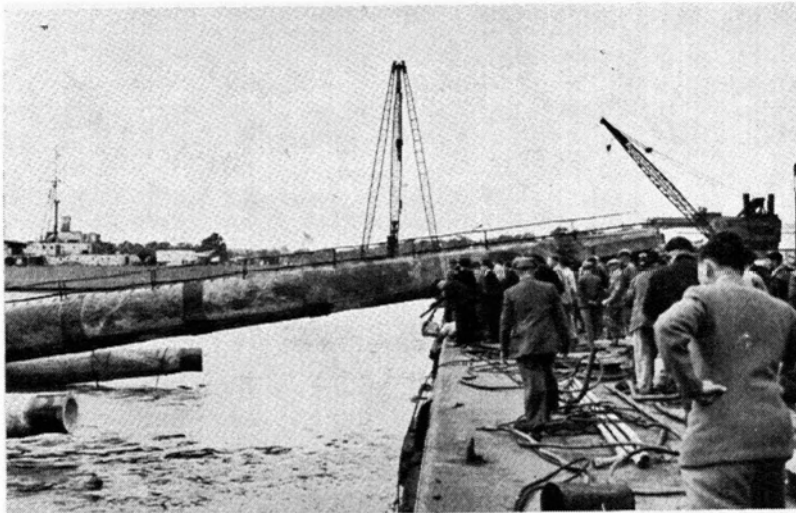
FINAL POSITION OF SHEERS ON THE RAMP
